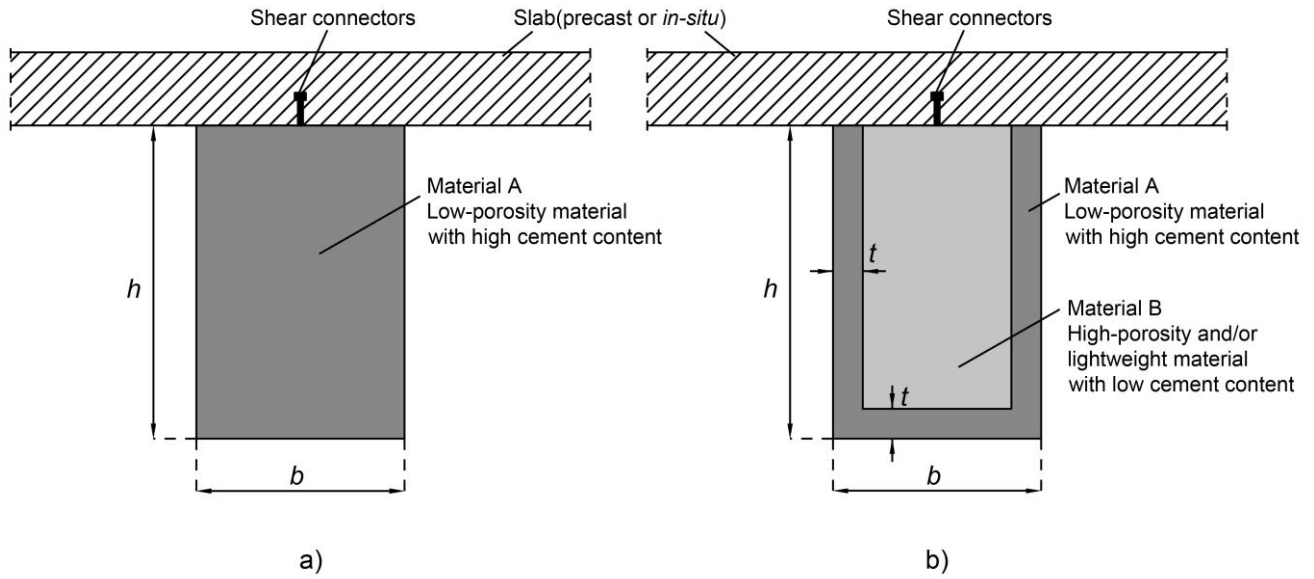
Prismatic pre-cast concrete beams: (a) typical cross-section with homogeneous concrete composition and (b) functionally layered beam section with a low-porosity U-shaped external protective layer.
